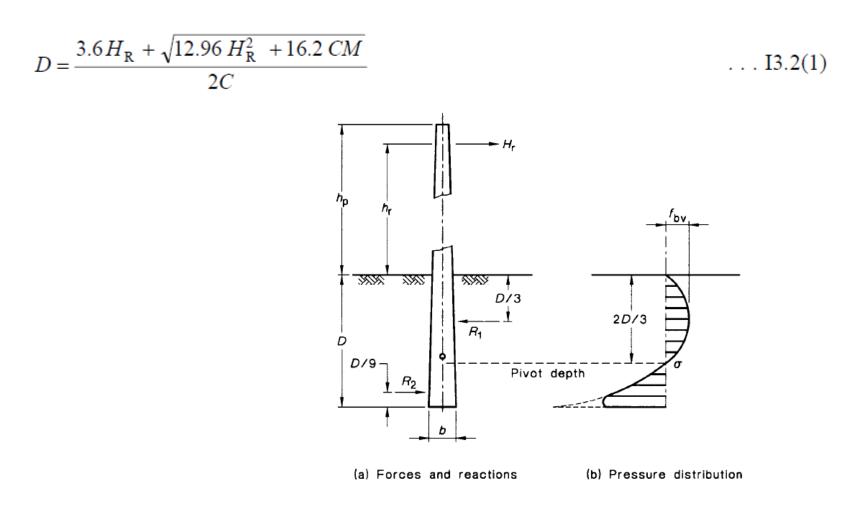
FORCES ON FOOTINGS AND FOUNDATIONS (VARIABLE EMBEDMENT)
